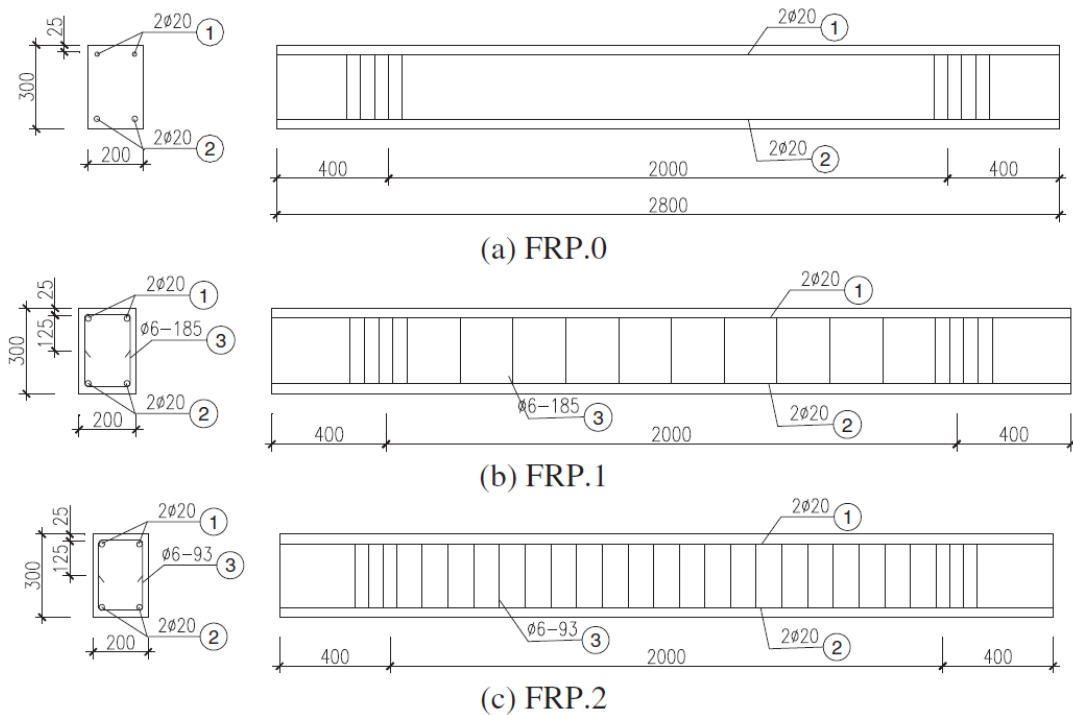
Details of section and reinforcement of tested beams in the reported experiment [39].
